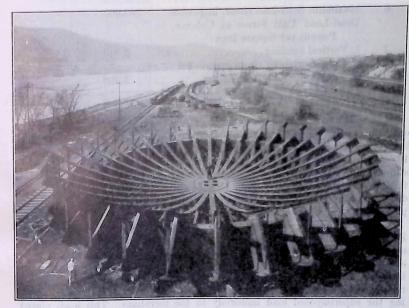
Test Assembly of Ring Girder and Bottom Drum at the Fabricating Plant
